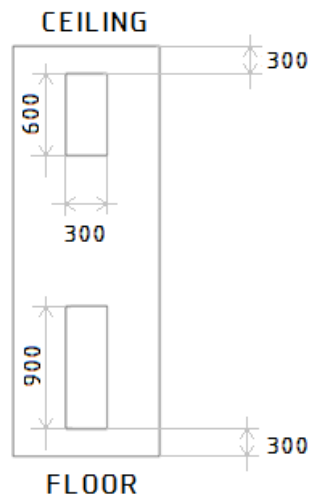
Exhaust grilles positions and dimensions in the OT B2
